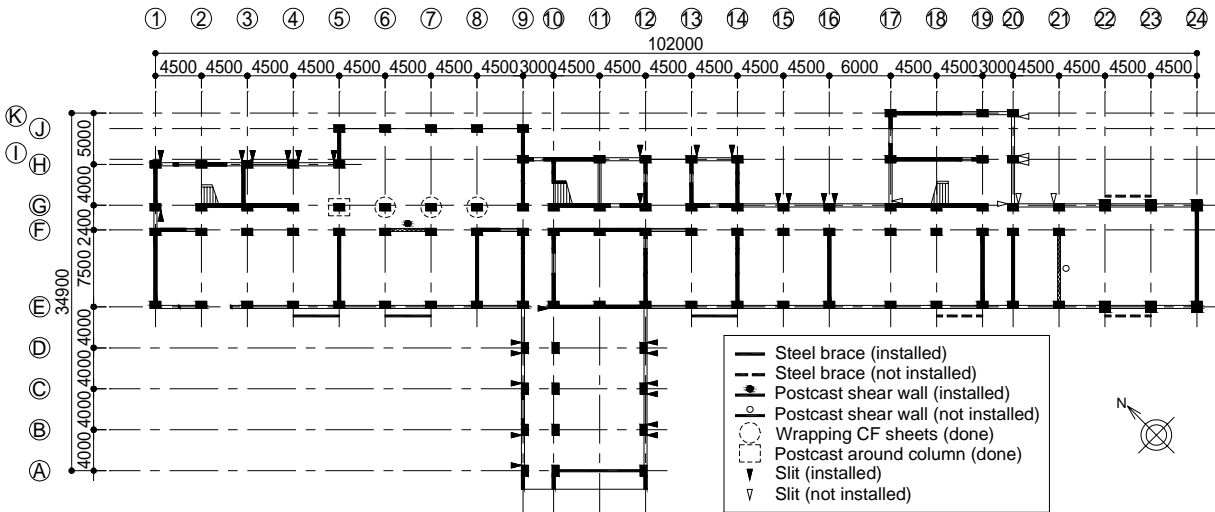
Plan of 1st floor (T-1 building of T-High school)
